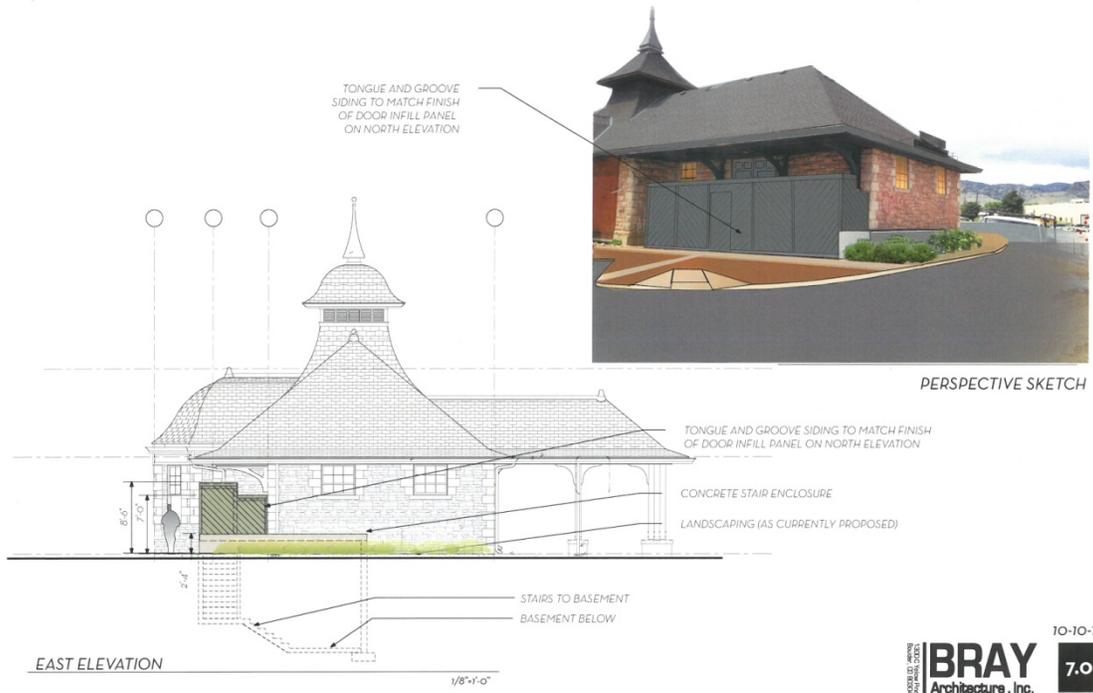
Proposed East Elevation and Perspective Sketch, 2014.
